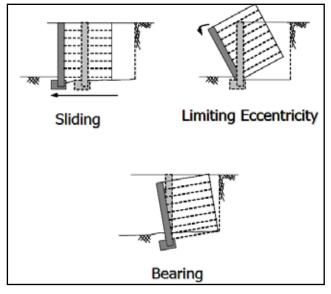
Failure modes for reinforced earth walls with respect to external stability
